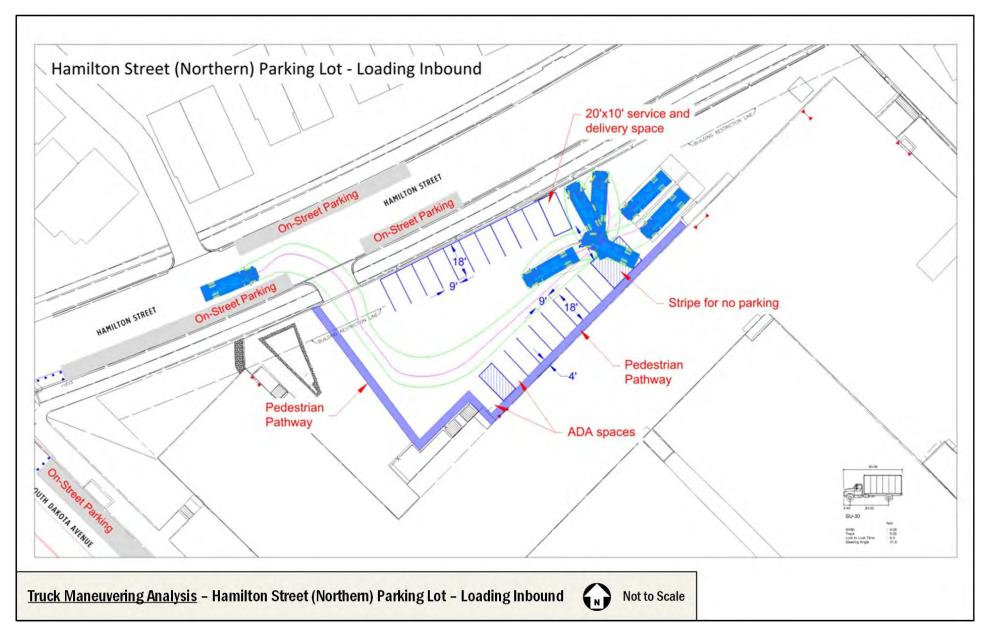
Hamilton Street (Northern) Parking Lot – Loading Inbound
